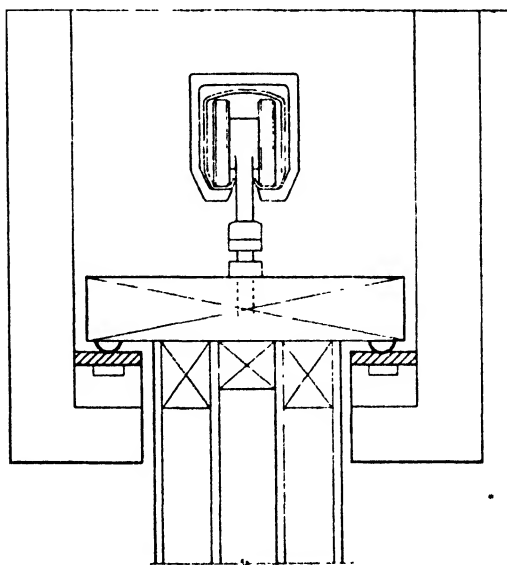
SEAL TO HEAD OF SLIDING DOOR
